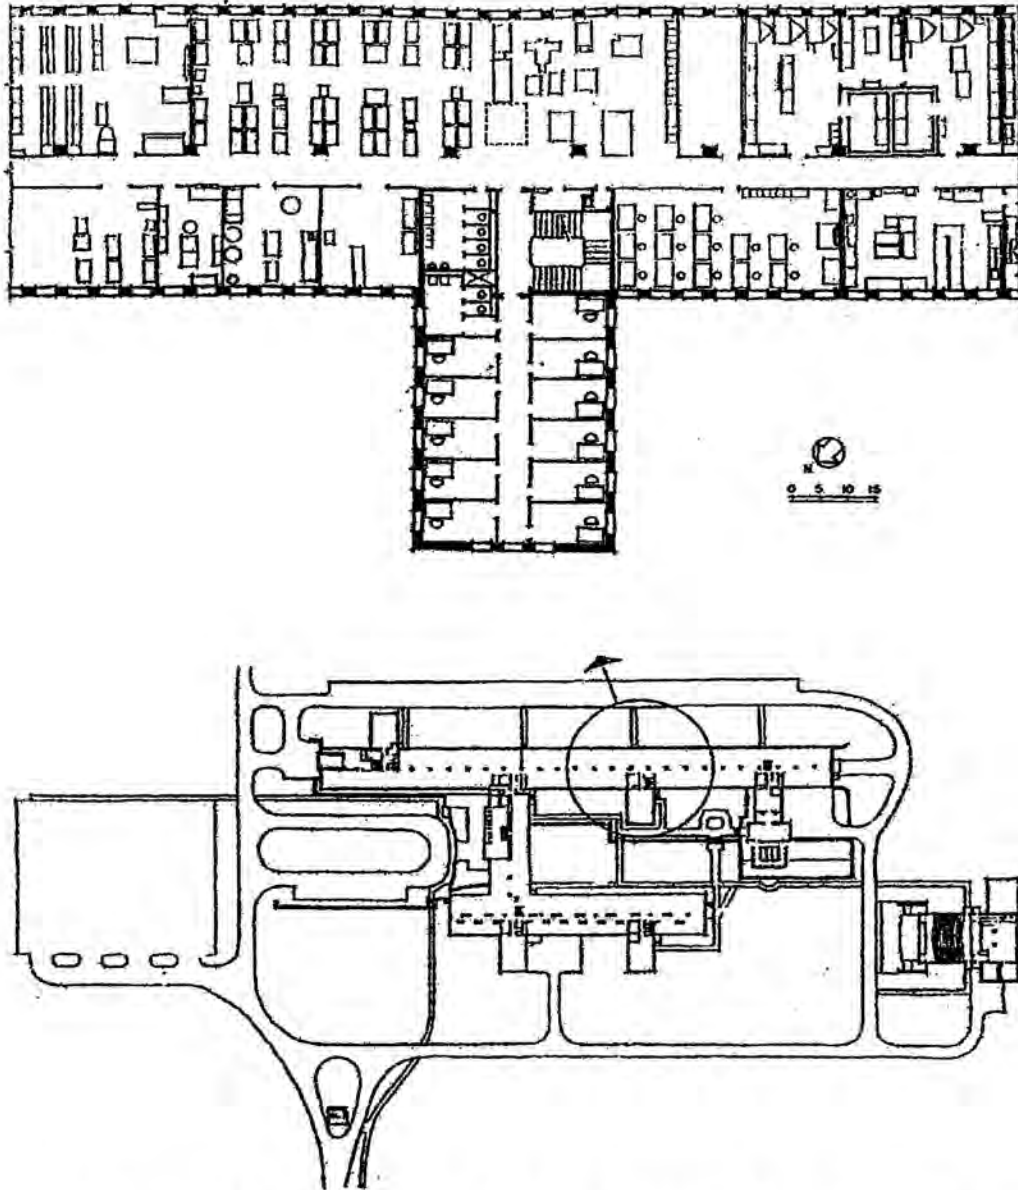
The whole plan of the main building of Bell Telephone Laboratories with detail of "T" unit shown above
